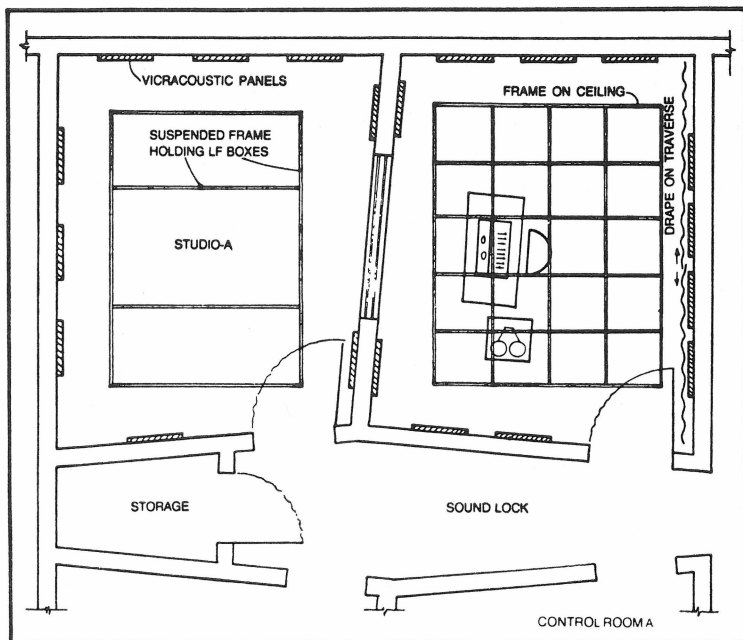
Projected ceiling plan of Studio A and its control room showing position of the following acoustical elements: Vicracoustic wall panels, frame suspended from ceiling in Studio A, frame fastened to ceiling in Control Room A and drapery on traverse in Control Room A.
